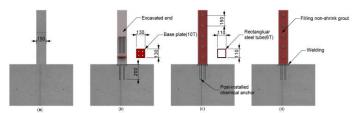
Elevations of Flexural Reinforcement Using Steel.
